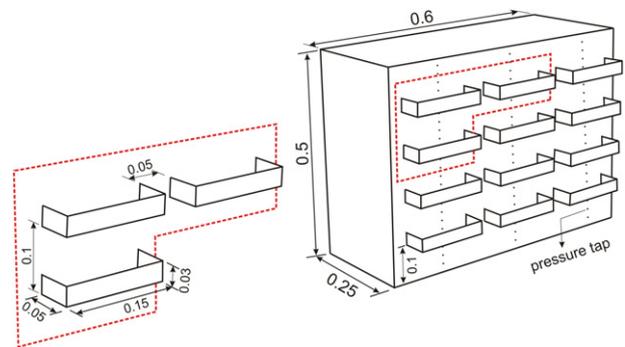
Geometry of building model and balconies (dimensions in metres at model scale).
